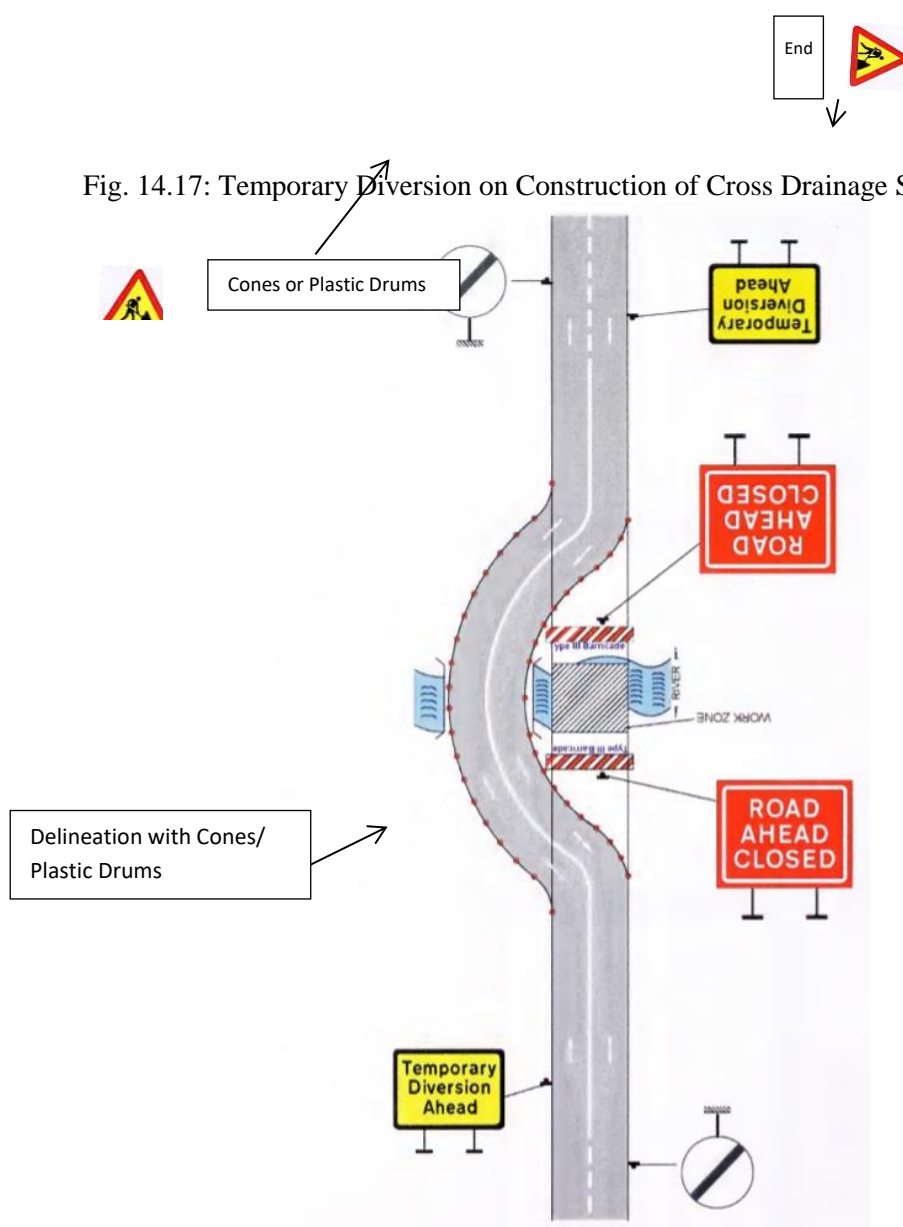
Temporary Diversion on Construction of Cross Drainage Structure
